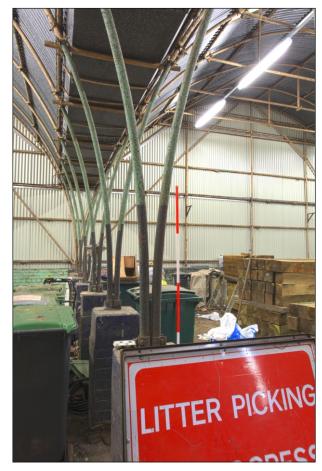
Detail of a typical row of piers and arch springs within the tank garages (Romney sheds)
